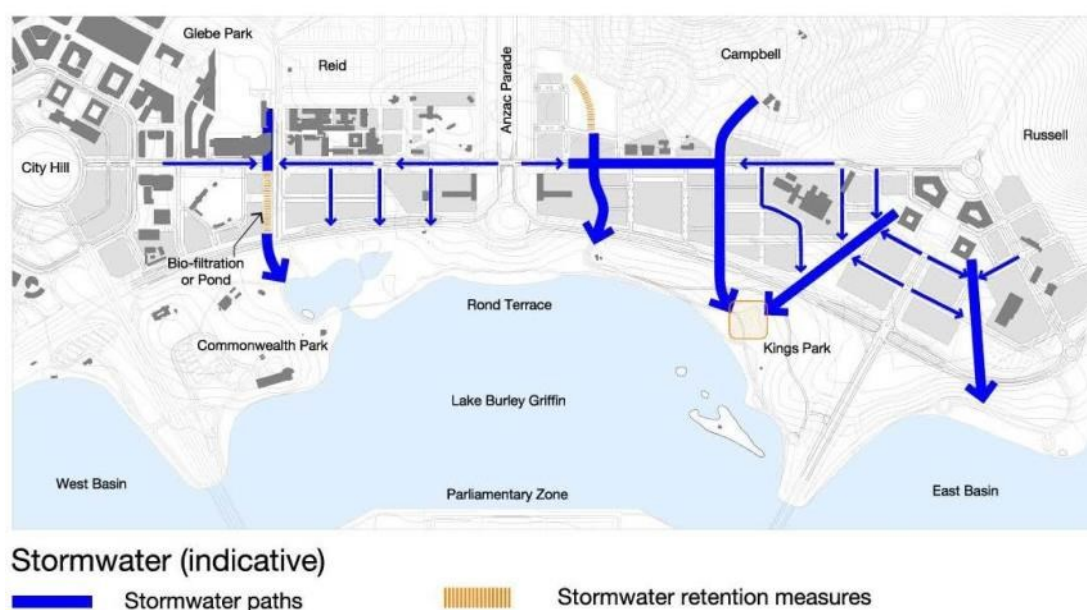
Constitution Avenue and Anzac Parade – Indicative stormwater (proposed)
